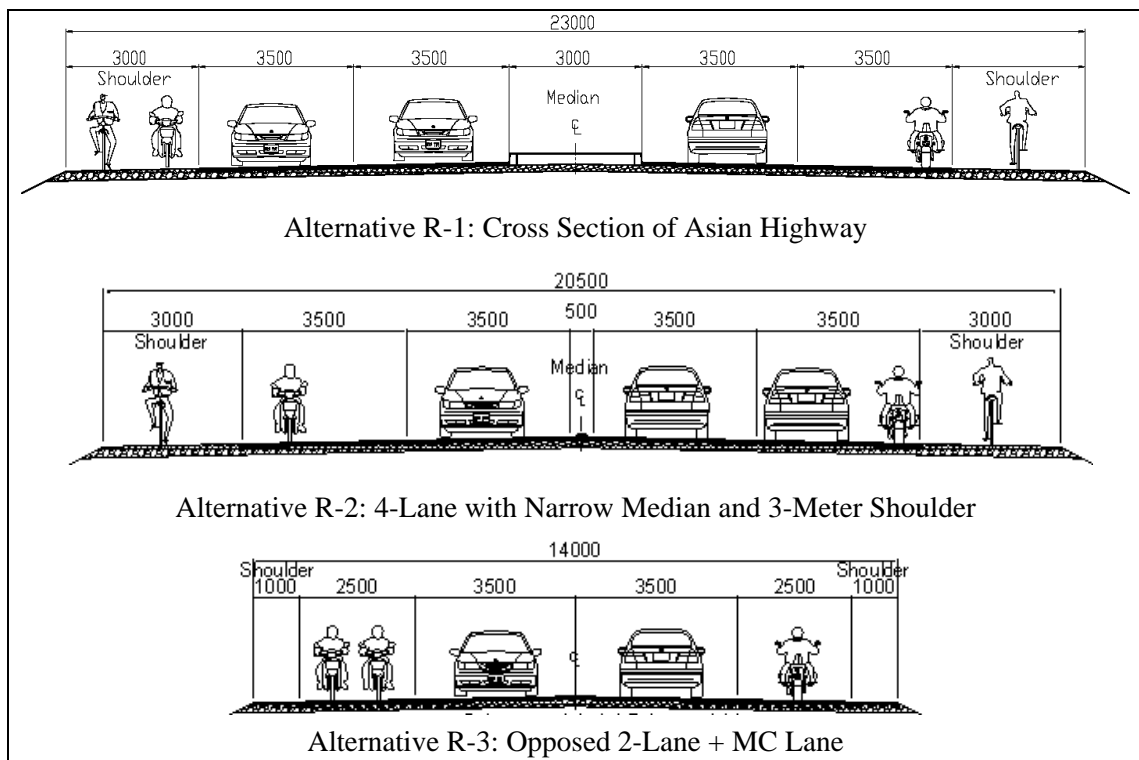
Alternatives of Cross Section for Rural and Suburban Areas
